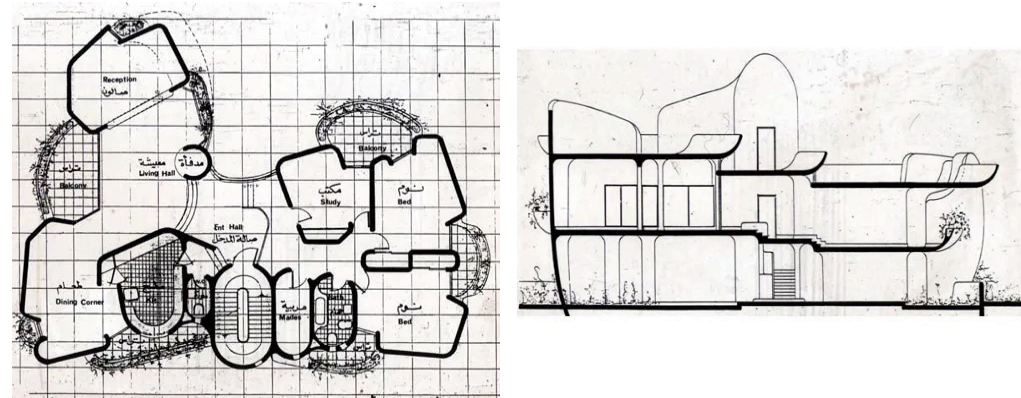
Plan and Elevation of the Villa, original design by Gamal Bakry
